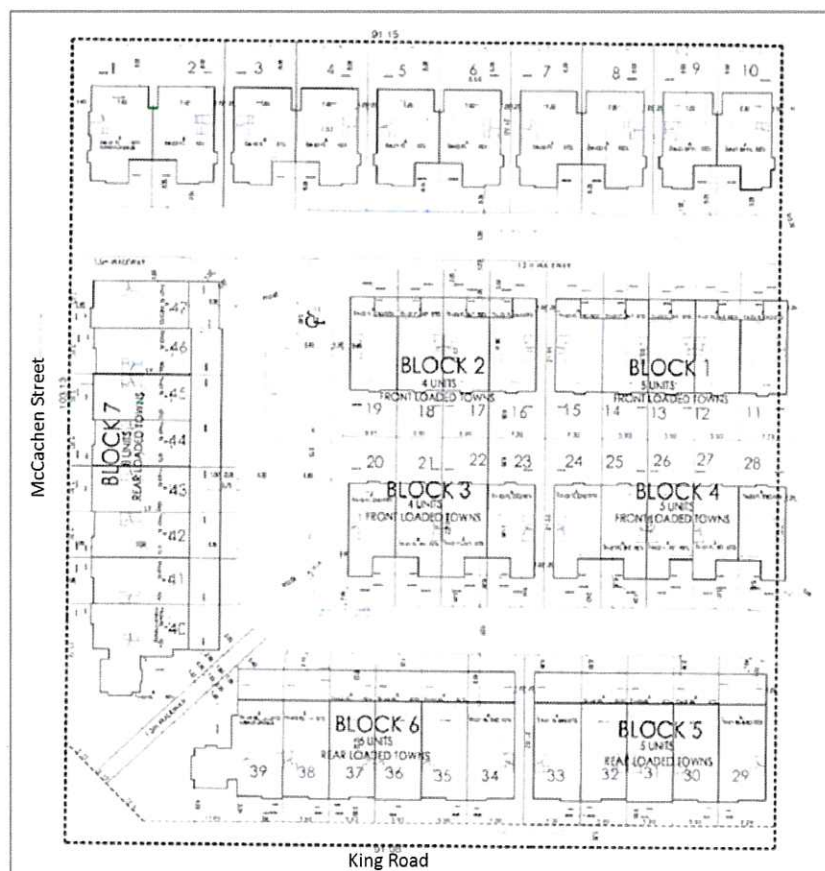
Fifth Avenue Inc. proposed Site Plan
